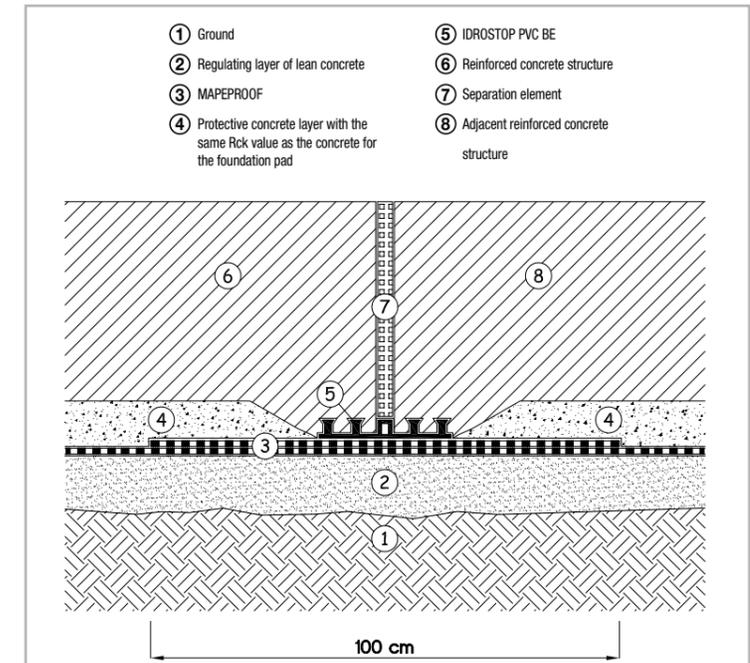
Detailed layout of sealing a structural joint with IDROSTOP PVC BE
